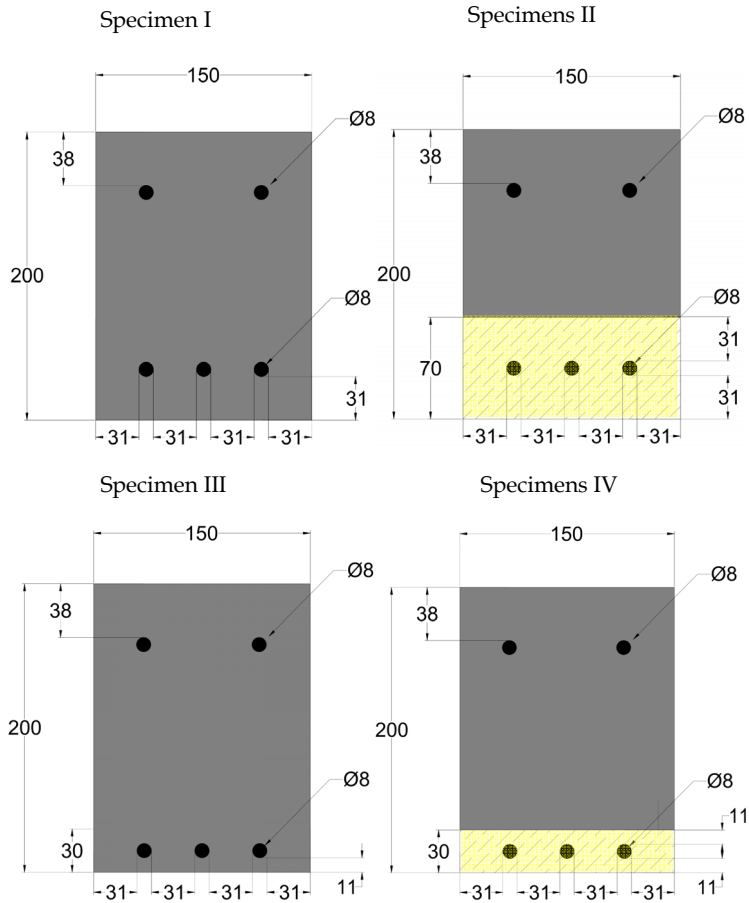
Cross sections of beams; concrete = grey, SHCC = yellow (units in [mm])
